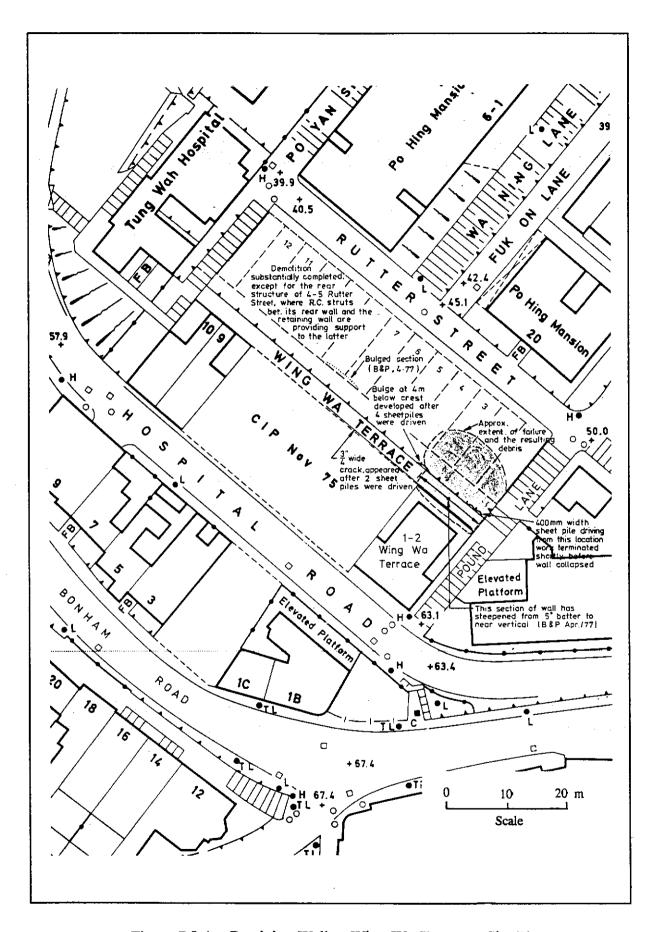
Retaining Wall at Wing Wa Terrace - Site Plan
